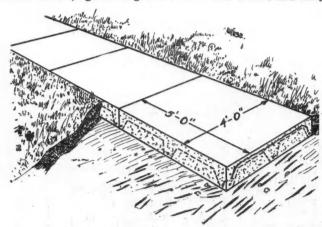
Shows an "X" Ray View of Beam Construction Sidewalk as it Appears After it Is Laid. Use of this construction saves material and provides a good walk if properly constructed and reinforced.
